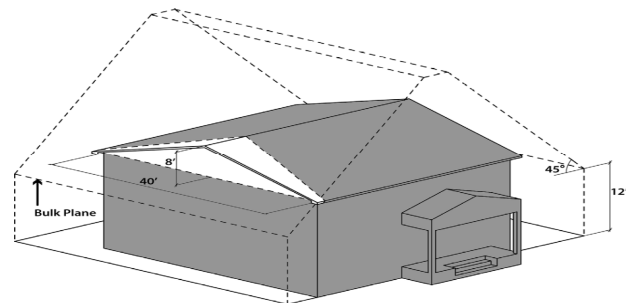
Gable Roof End Encroachment into the Side Yard Bulk Plane
